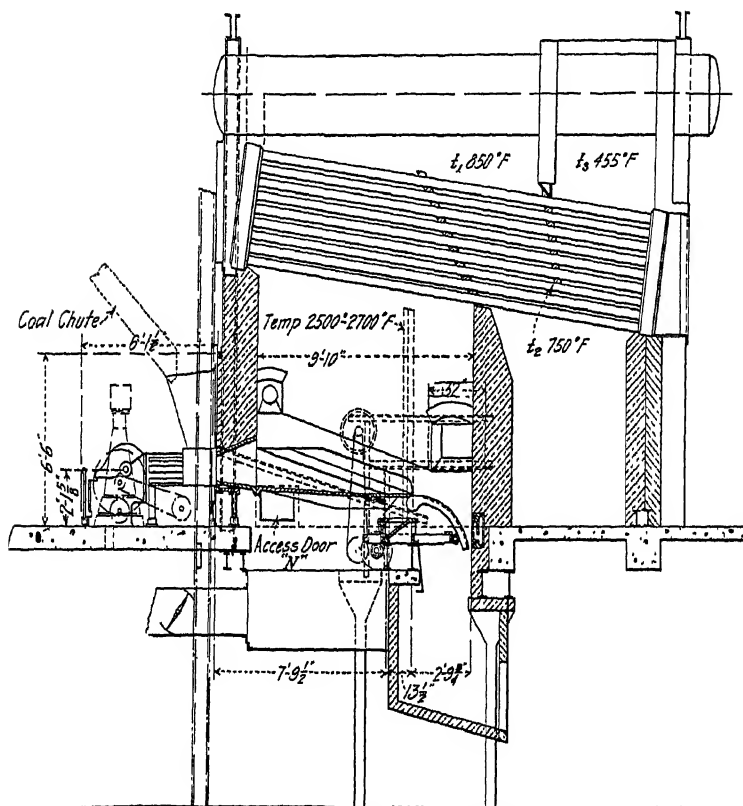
ASSEMBLY OF BOILER AND COMBUSTION EQUIPMENT INSTALLED AT PLANT OF BROWN & SHARPE MFG. CO.
